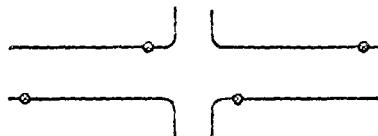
Siting recommended at the intersection of a lighted road with staggered arrangement and an unlighted road (driving on the right).
